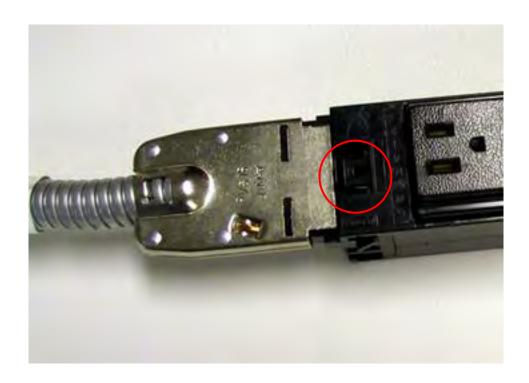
Completely Installed Electrical Outlet (Top View)
